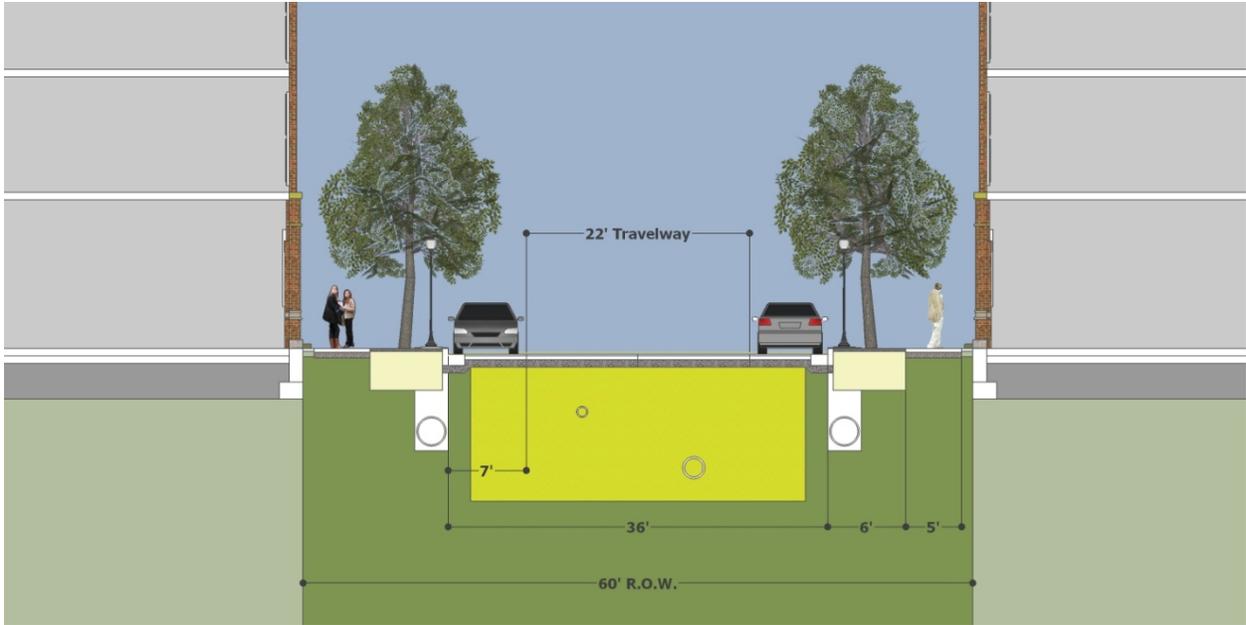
Local Street (ST-60-36) in north area . Right-of-way could be reduced to 38 feet when streetside areas are put in private ownership. PUEs are planned in alleys. Where necessary, PUEs will be provided along street right-of-way edges in order to provide connectivity in the system, based on a comprehensive PUE design established at Schematic Development Plan. See Figure 7 for typical street-edge PUE location.
